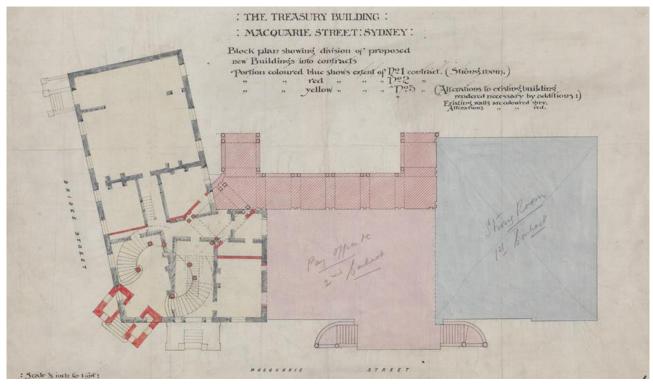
Extract of Architectural Plan for Proposed Additions to Treasury (showing proposed reconfiguration of existing Treasury Building which did not proceed)
